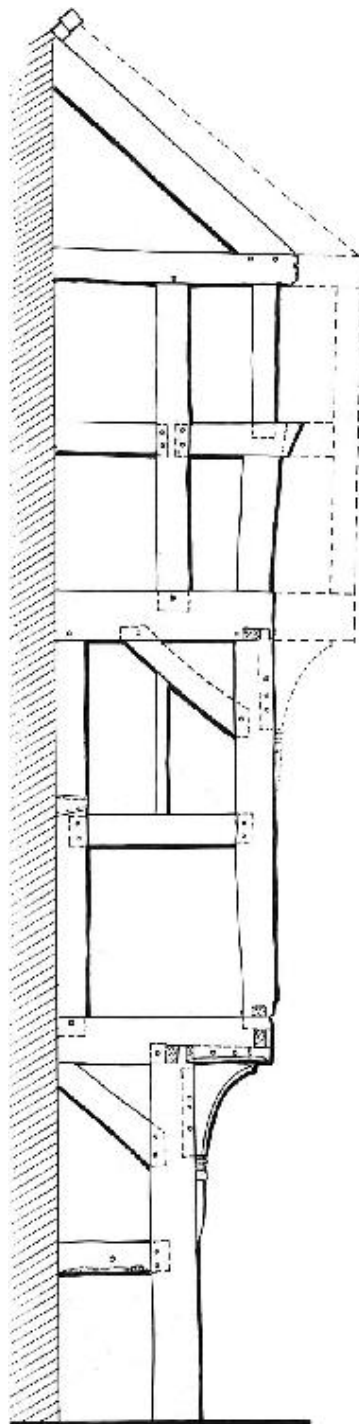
Survey drawing of the north-eastern corner of 7 St Peter's Street, with the presumed second-floor jetty added
